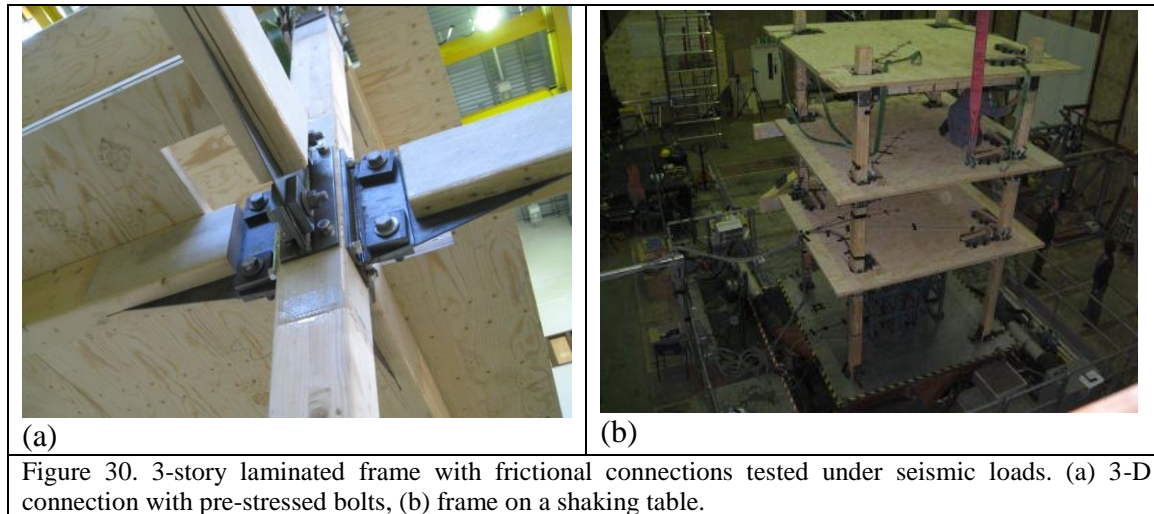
3-story laminated frame with frictional connections tested under seismic loads. (a) 3-D connection with pre-stressed bolts, (b) frame on a shaking table.
